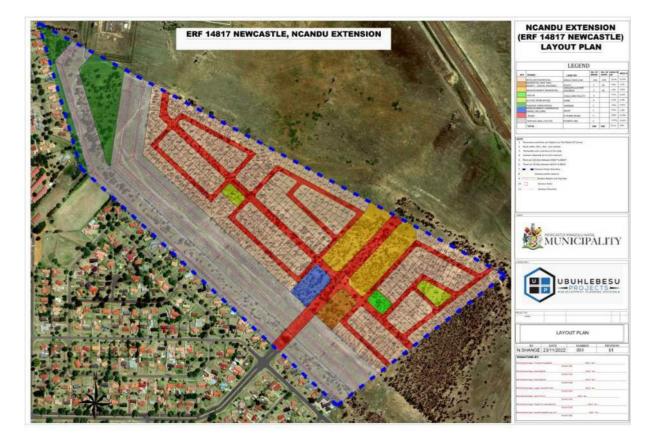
NCANDU EXTENSION LAYOUT PLAN
